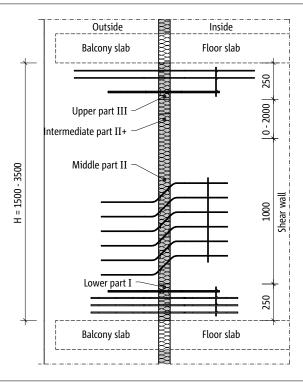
Schöck Isokorb® T type W: Layout; Balcony structure with thermally insulated load-bearing shear walls
